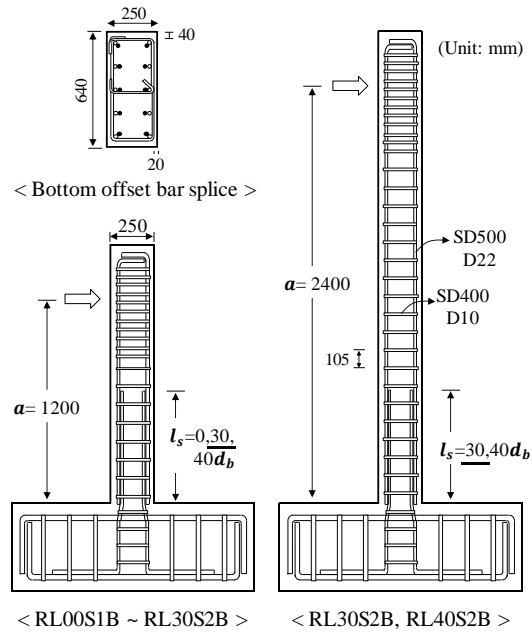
Dimensions and reinforcement details of rectangular columns
